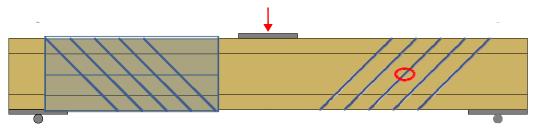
Principle of a shear reinforced beam using screws; marked area is reinforced
